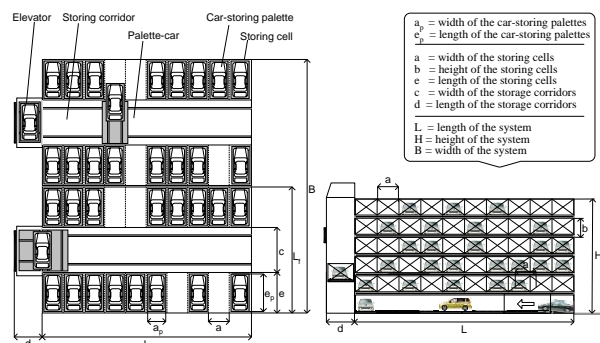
Multi-storey robotic parking facilities with aisle type distributed machinery: vertical elevators and horizontal satellite cars [2]
